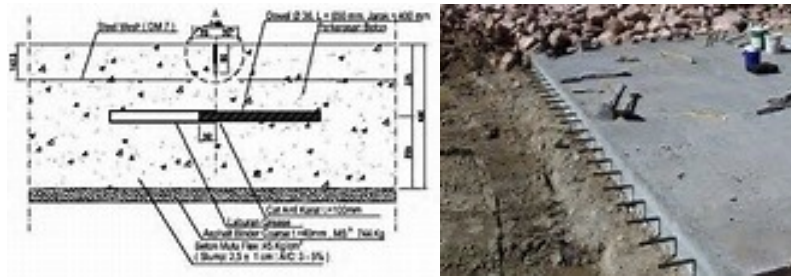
Dowel Bar Arrangement in Concrete Works
